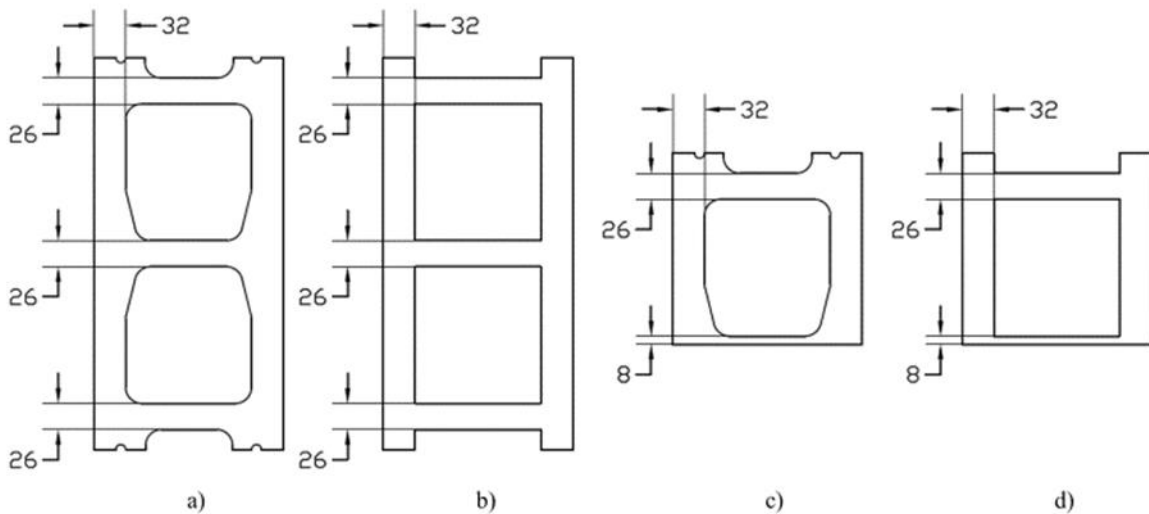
Cross section of the CMUs and FE model: a) Minimum CMU cross section; b) simplified FE block cross section; c) minimum CMU half-block cross section; and d) simplified FE half-block cross section (dimensions in mm)
